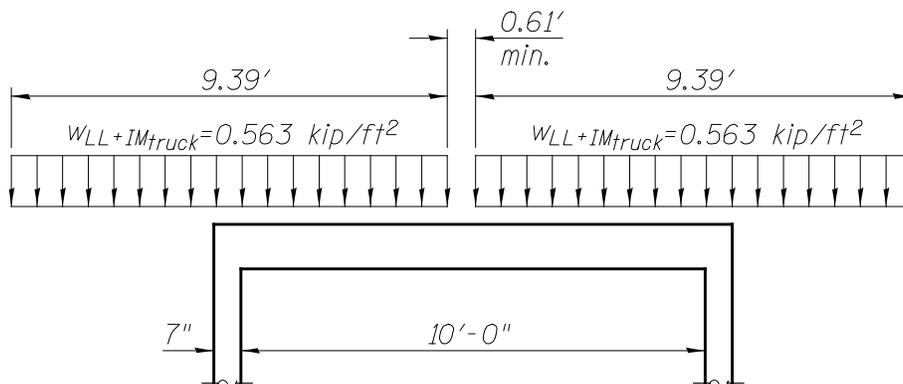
Worked Example 3 – Truck Load (2 Lane)
